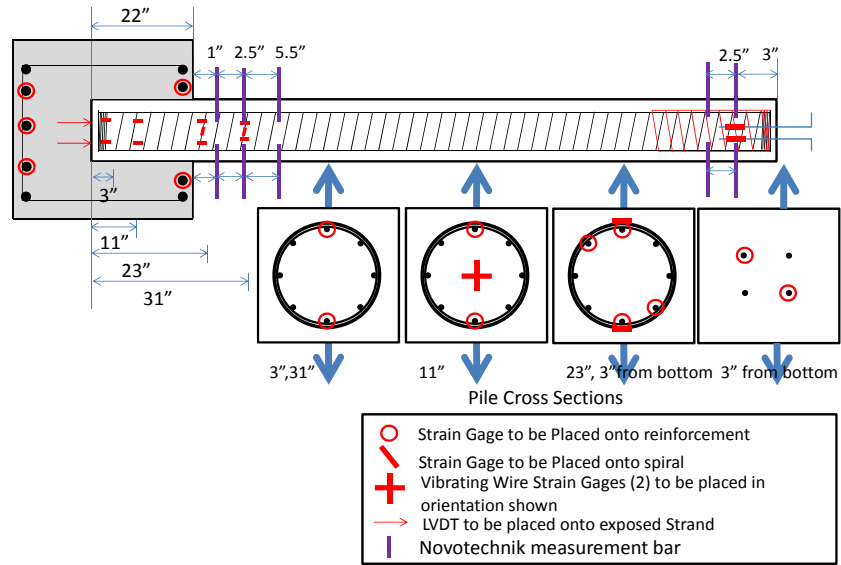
Pile Strain Gage Layout - Three Pile Specimen
